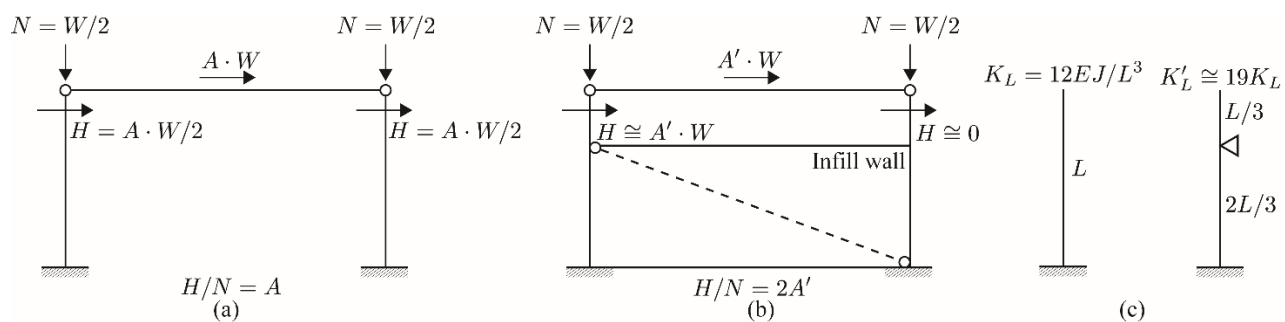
Short column effect in a terminal frame with infill walls and a strip window: a) a central frame without infill wall; b) an infilled frame with strip window; c) stiffness variation due to the short column effect.
